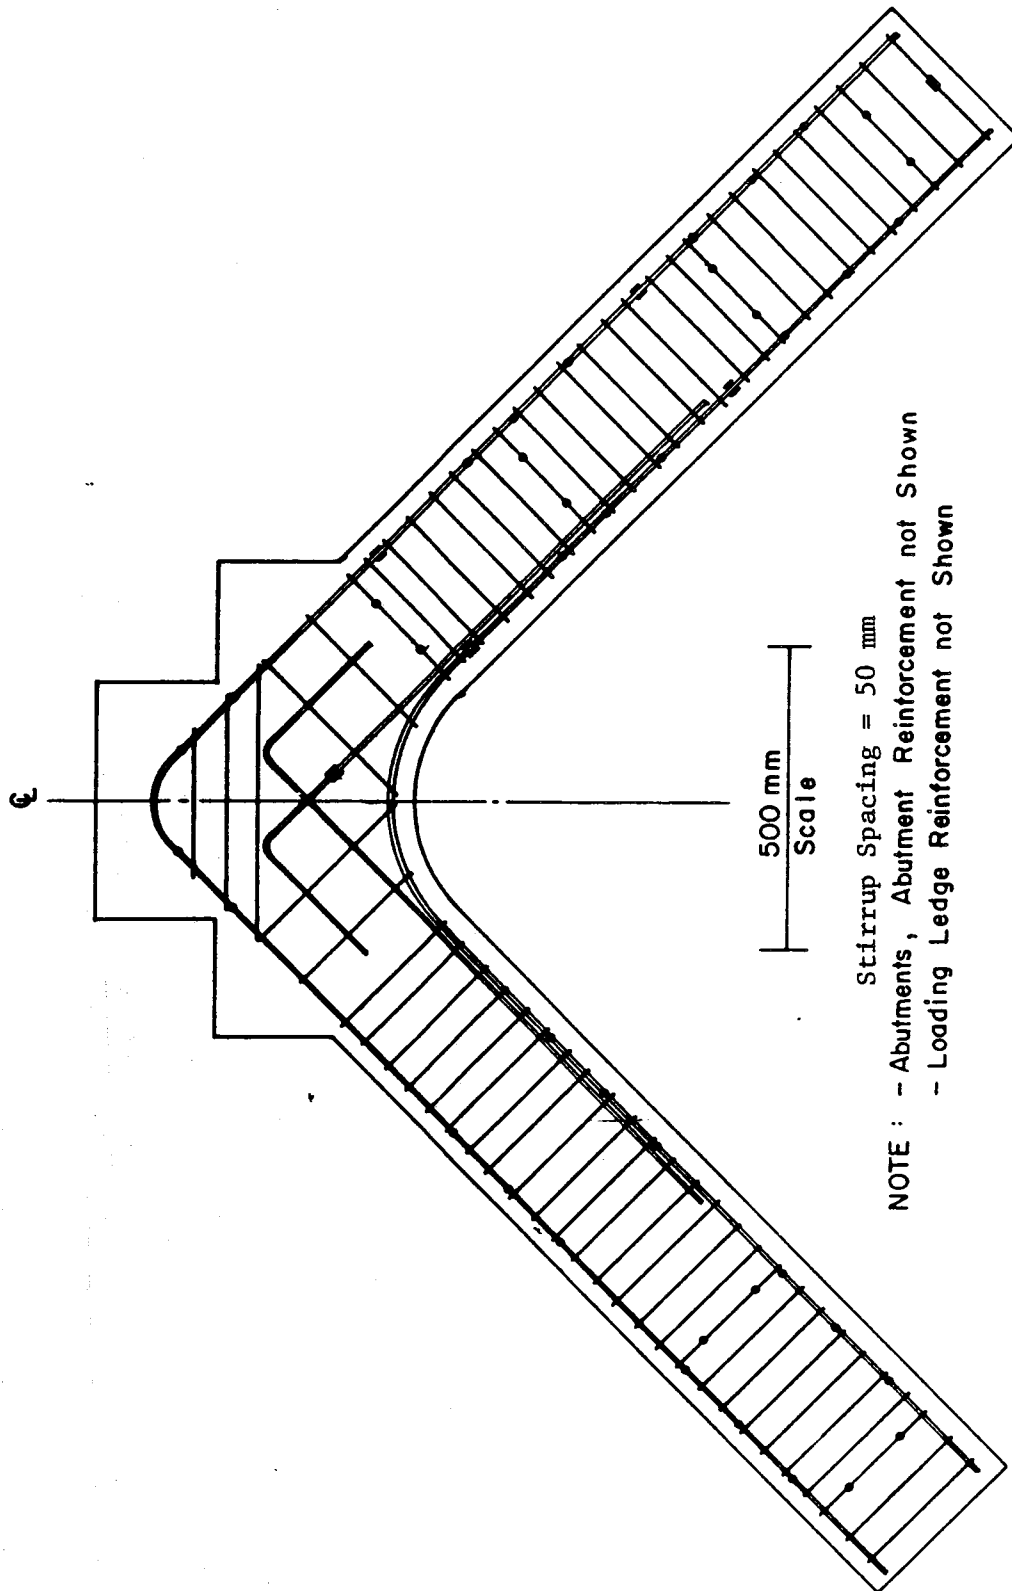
Reinforcing Details for Specimens A1 and A2
